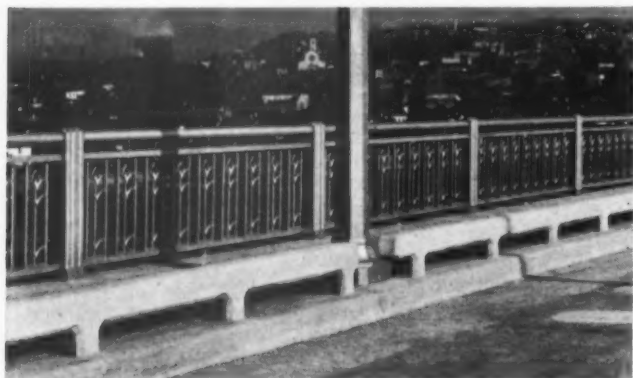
Detail of Heavy Duty Guard Rail on Pittsburgh-Homestead High Level Bridge.
